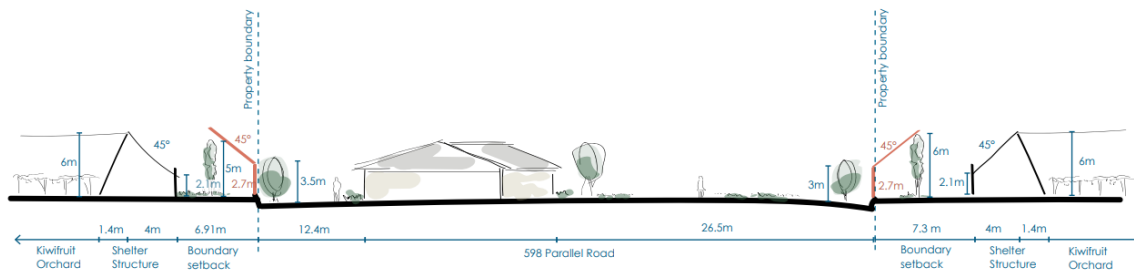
Southern Elevation Plan with Shelter Belt Planting Shown and HIRB
